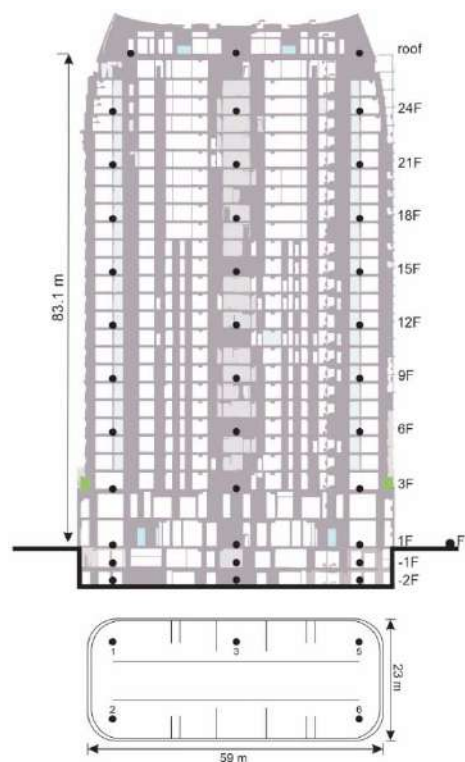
The elevation and floor plan with measurement points in a newly constructed T1 building. (● - Measurement points)
